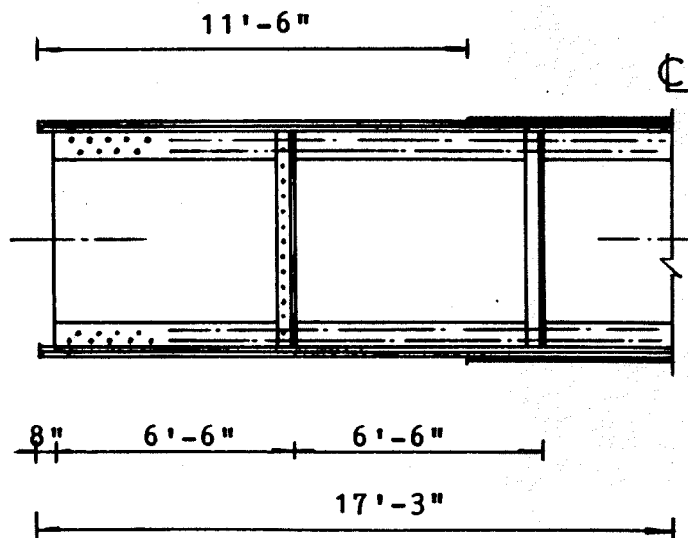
Geometry and Profile of Test Girders for Direct-Testing
